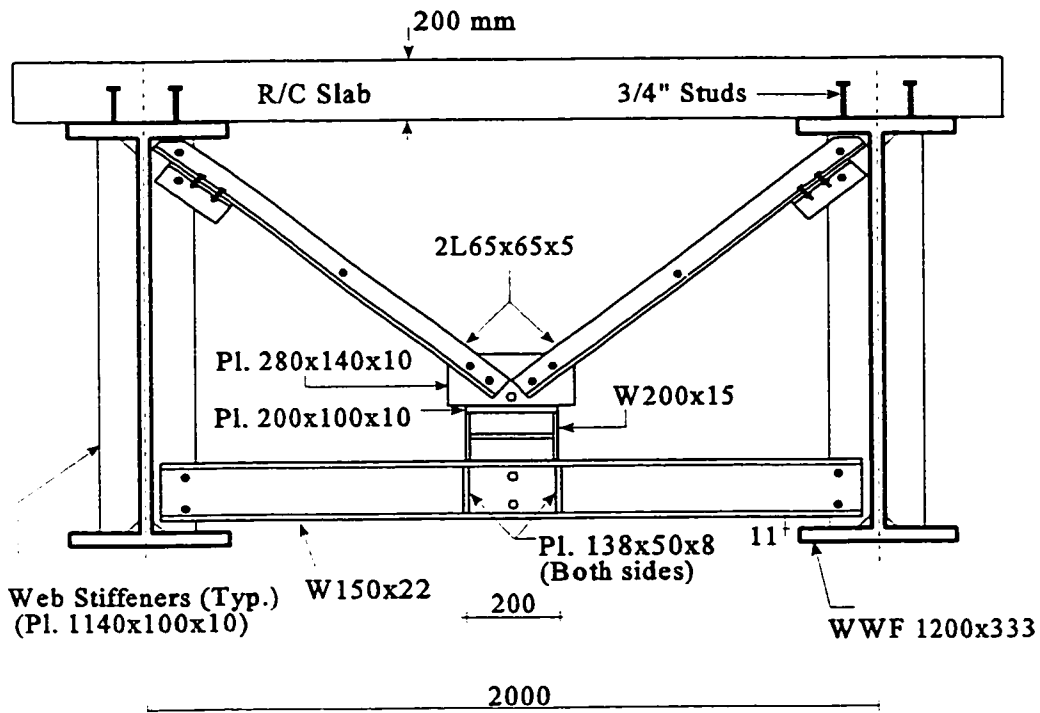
Elevation of ductile end-diaphragm SPS specimen with a W200x15.
